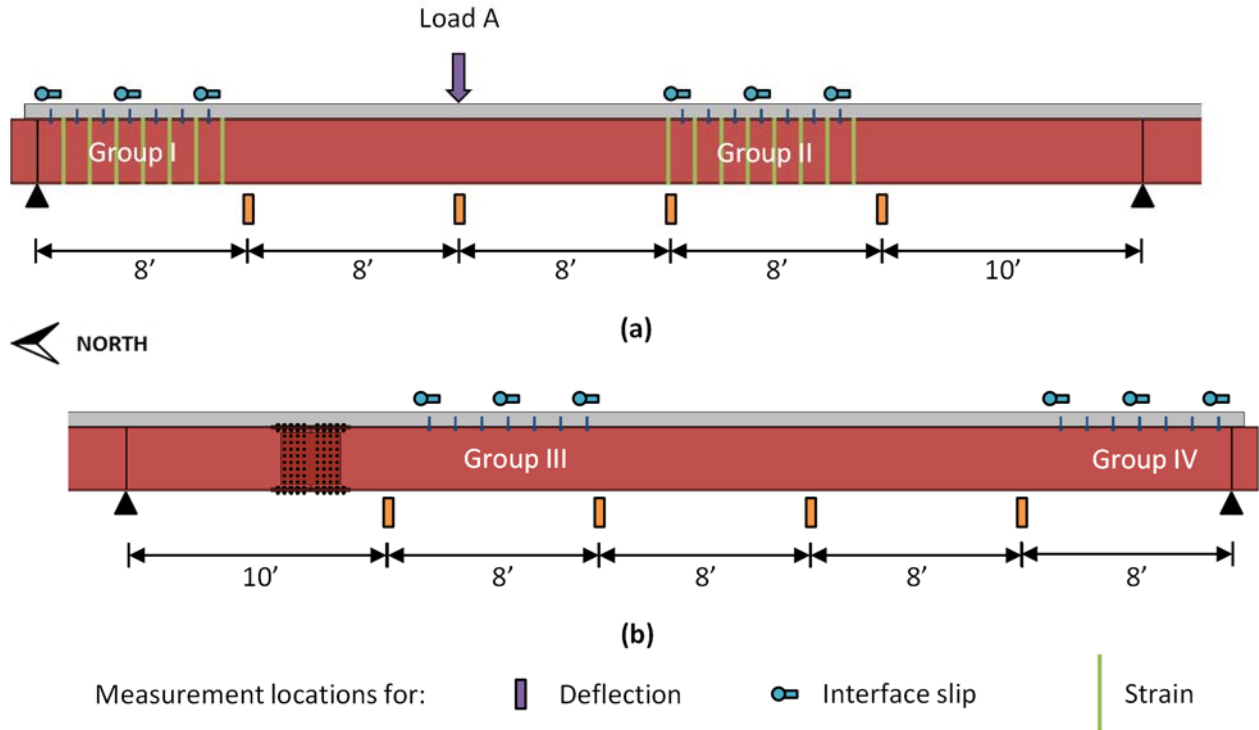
Instrumentation for North Span Fatigue Test – (a) North Span and (b) South Span
